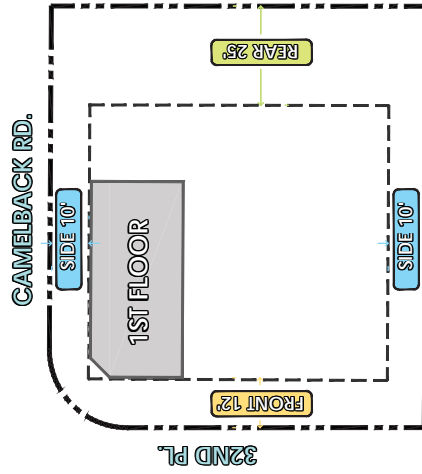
BUILDING SETBACK EXHIBIT
